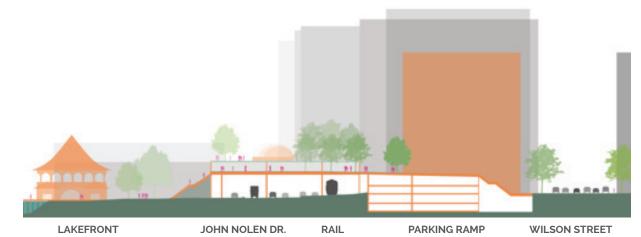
DESIGN TEAM ONE: FULL BUILDOUT CONCEPT SECTION
